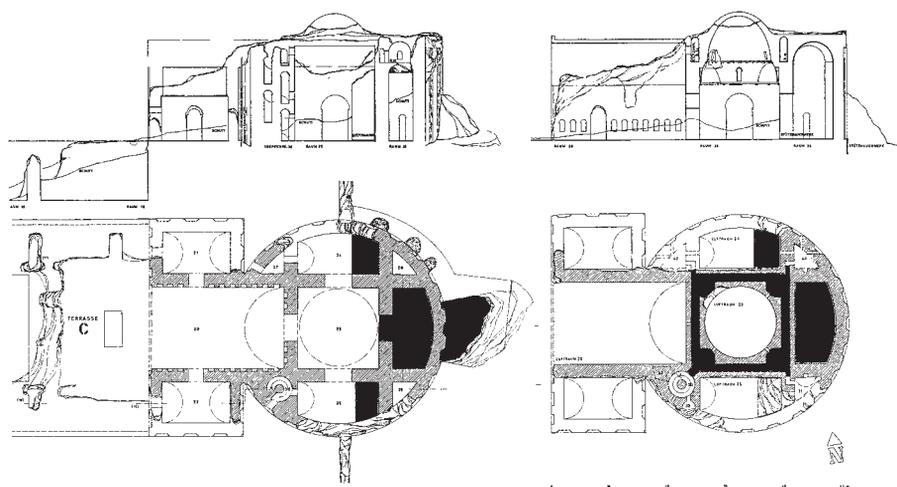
Firuzabad. Qal'a-ye Dukhtar, first palace of Ardashir I. Plans and sections of ground floor and of upper story around copula. (Black areas: Consolidating masonry, walled up in ground floor and upper floor rooms during Sasanian repairs).
